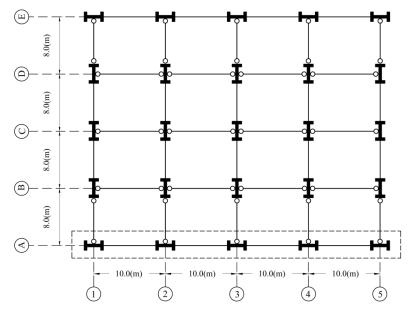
Plan view of a ten-story steel moment-frame structure with the same floor plan for all stories
